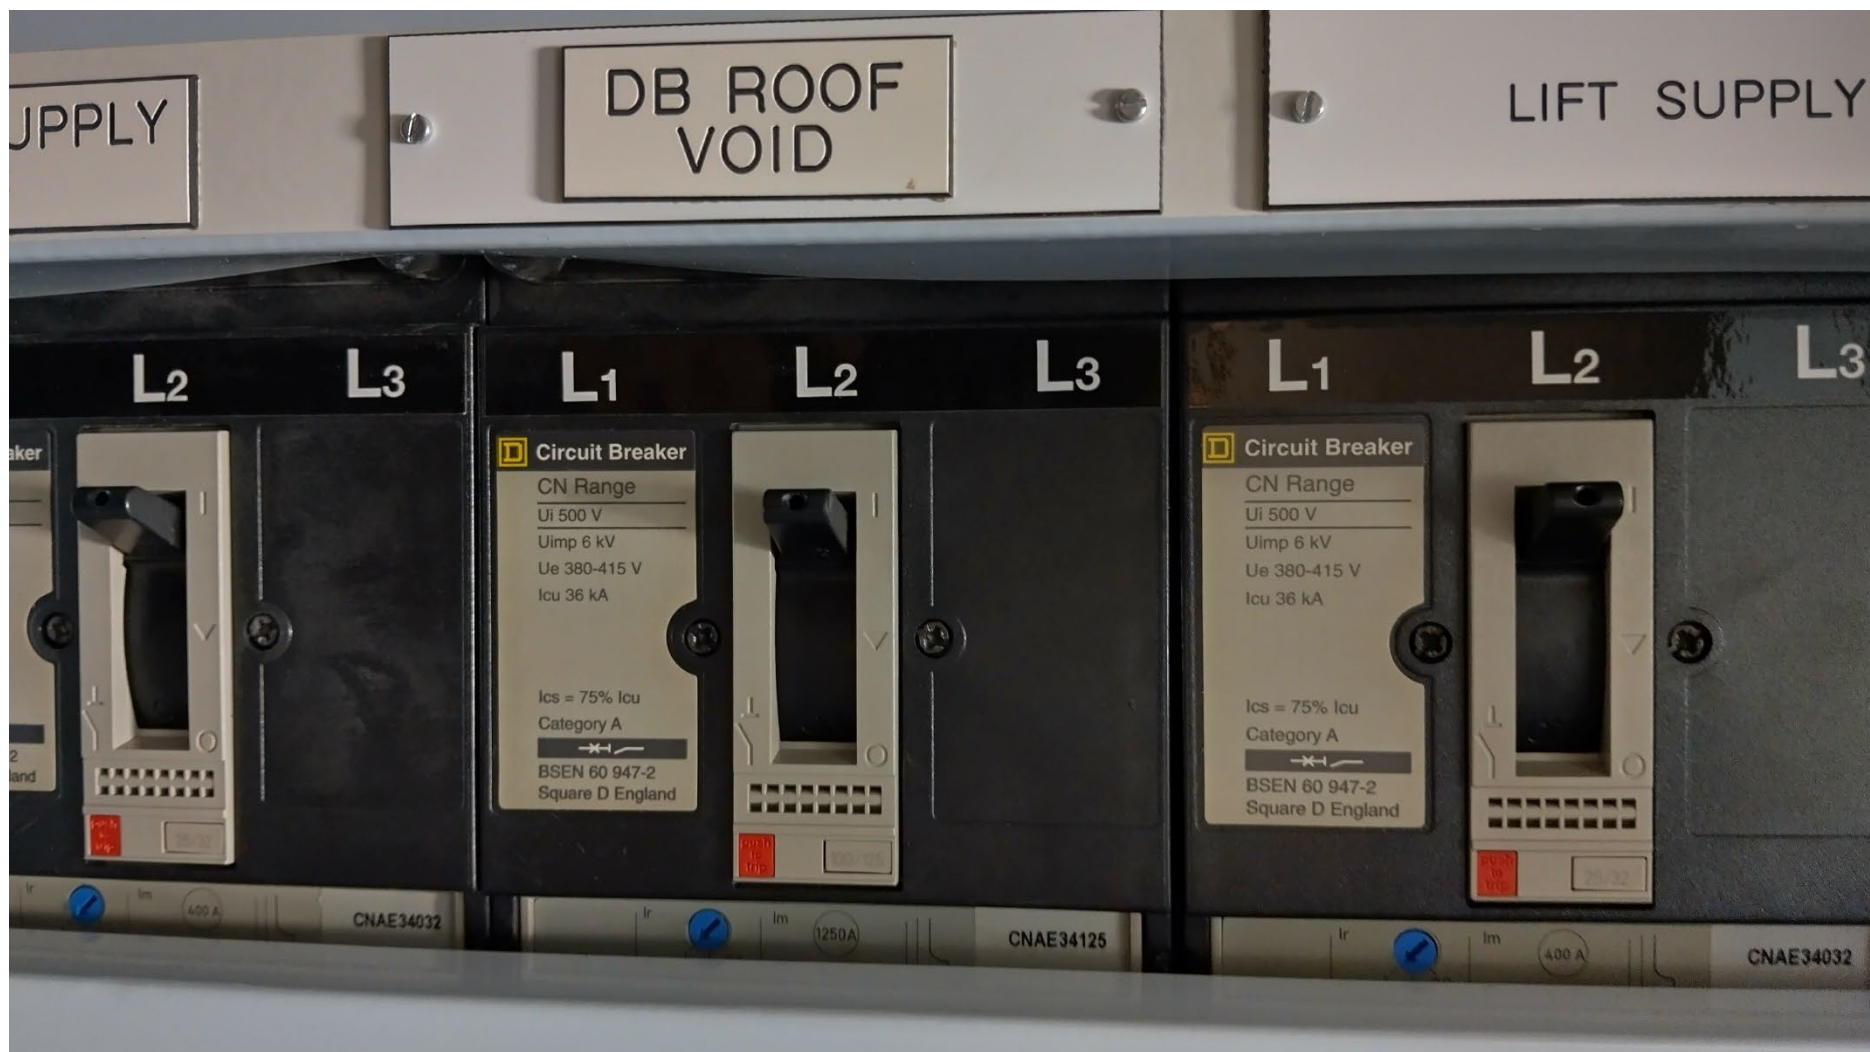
Breaker in main panel feeding lightly loaded “DB Roof Void” board on top floor (this photo: Chilgrove Hall)
